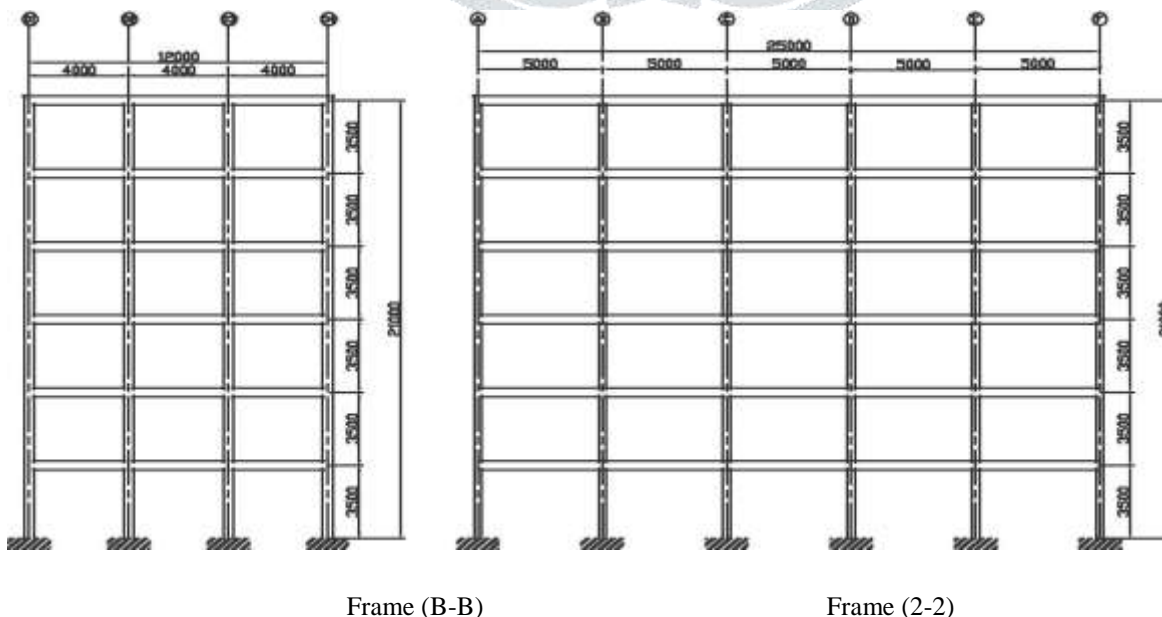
Frame (B-B) and (2-2) Of six-story regular R.C. building (all dimension in mm)
